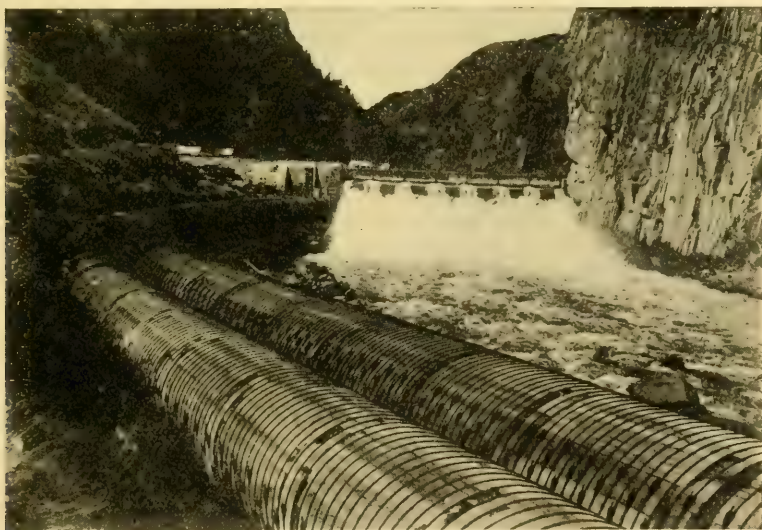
Montana Power Company. Dam and Wooden Penstocks for Madison No. 2 Plant.
